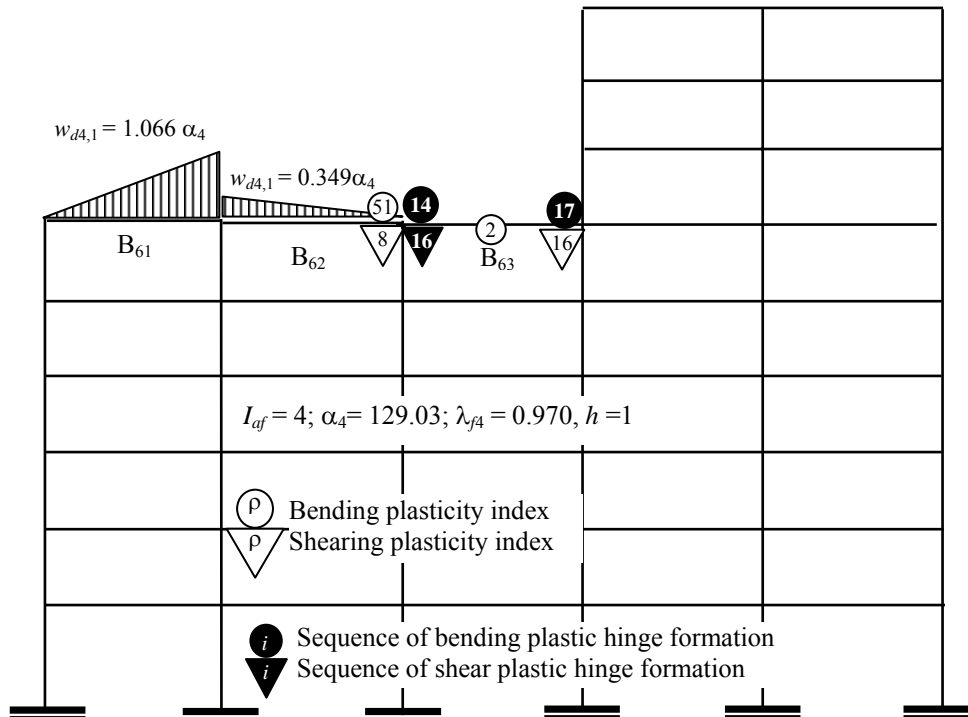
Example 2 ((Los Angeles): Beam B_7 falls as debris loads and fails beam B_{63} (Stage 4)
